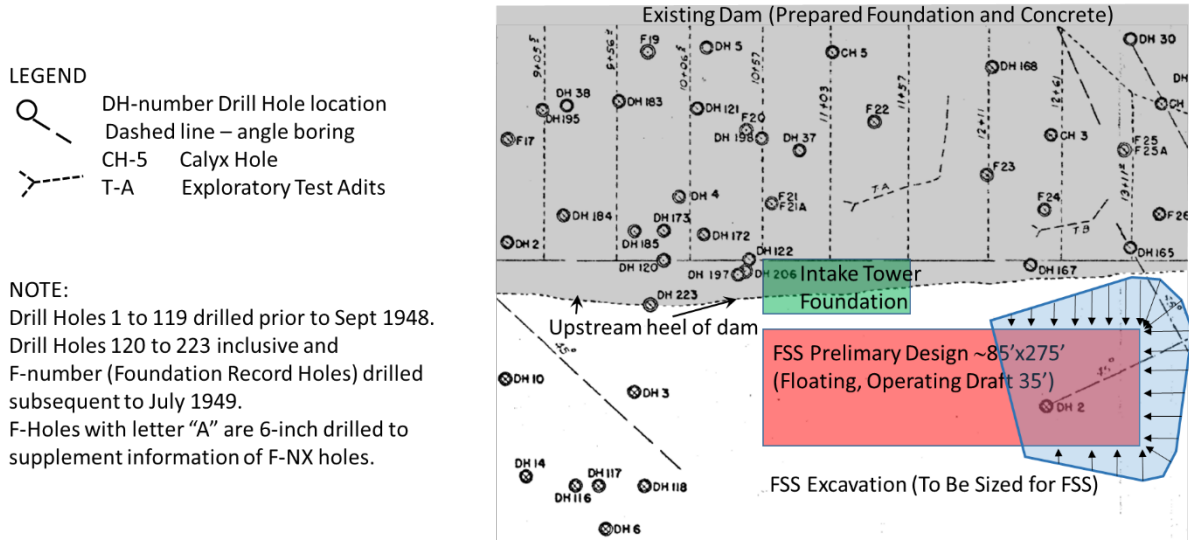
Existing Explorations Near SWS Tower and FSS (Conceptual Excavation)
